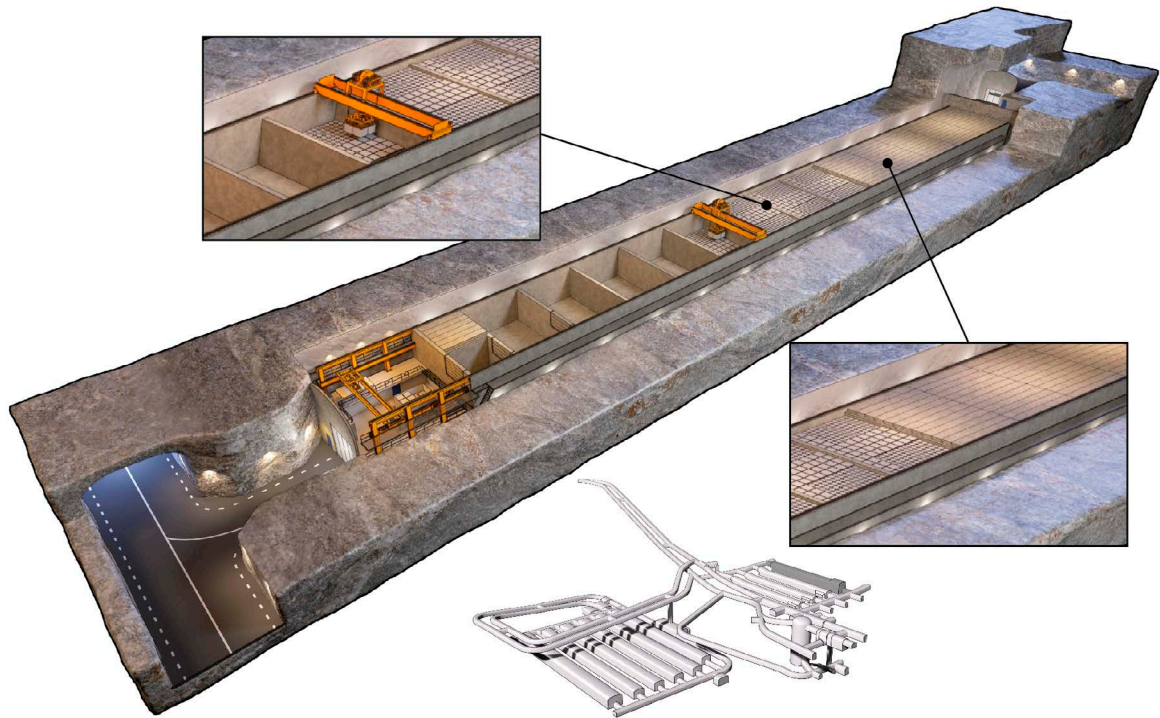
Illustration of 1BMA during the operational period. The upper detail shows the emplacement of waste packages, the lower detail shows the concrete lid. In addition, there is a view of SFR with the position of 1BMA highlighted.
